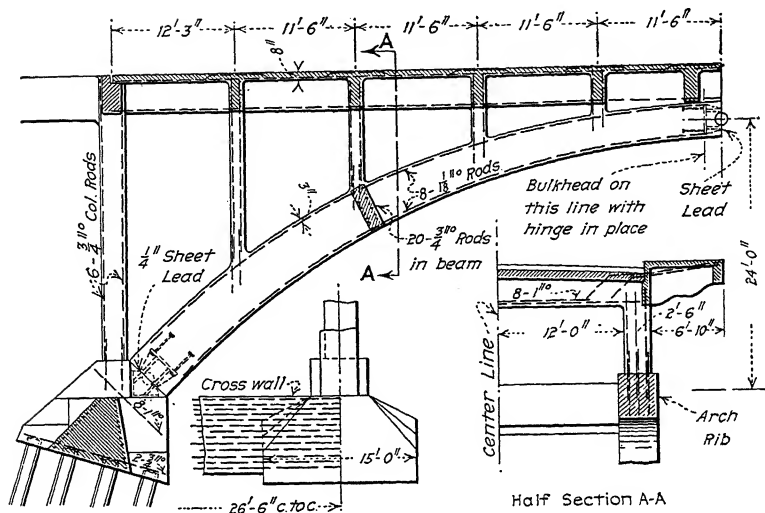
Details of Fourth Street bridge, Paducah, Ky.
